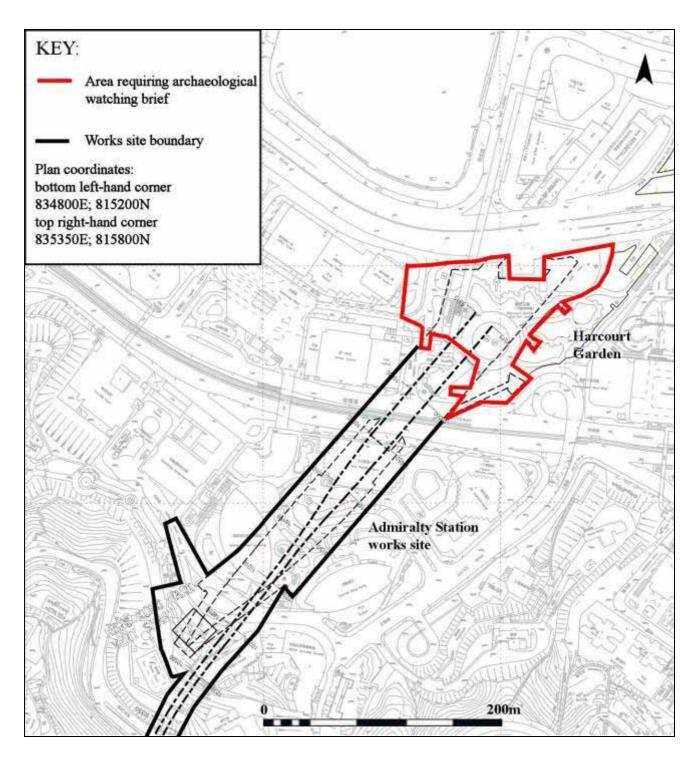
Plan of Admiralty Station works site with area requiring archaeological watching brief at Harcourt Garden outlined in red.
